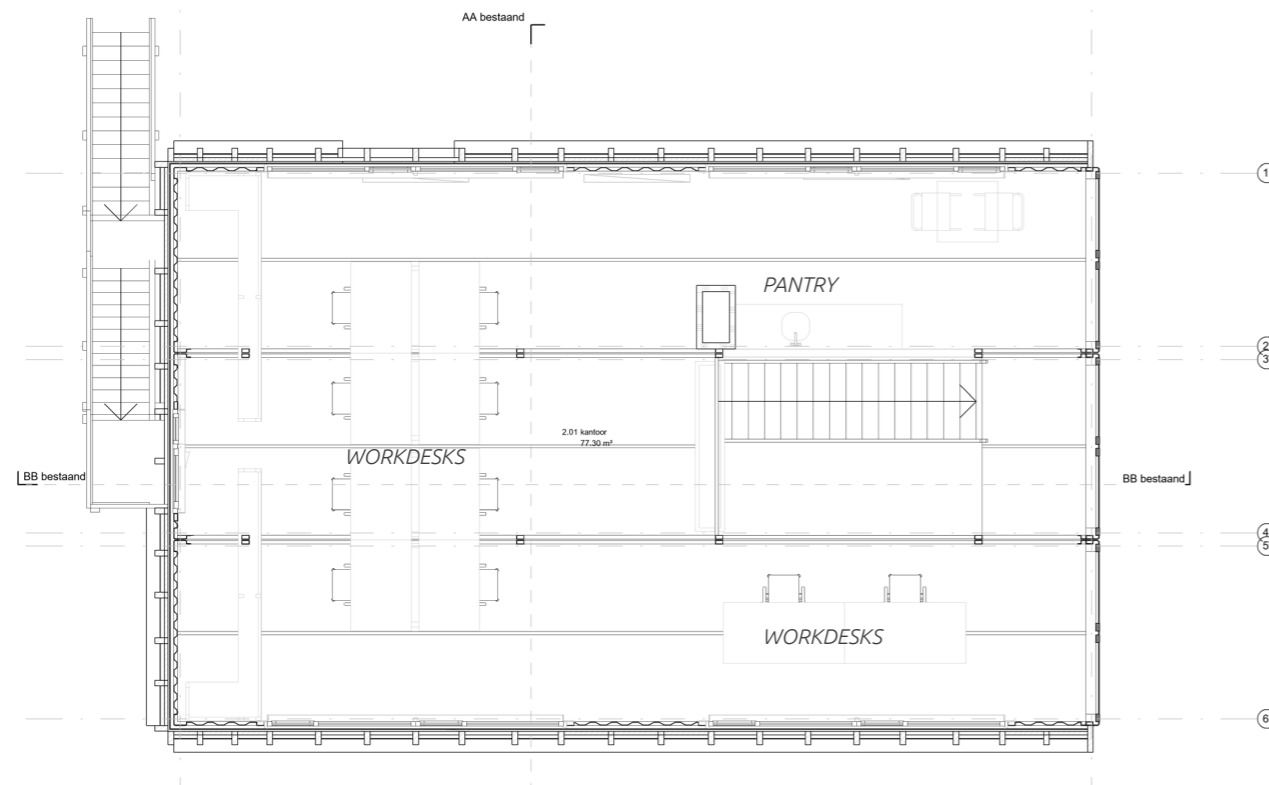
Second-floor plan. (Courtesy - DOOR Architects) (Not to scale)
